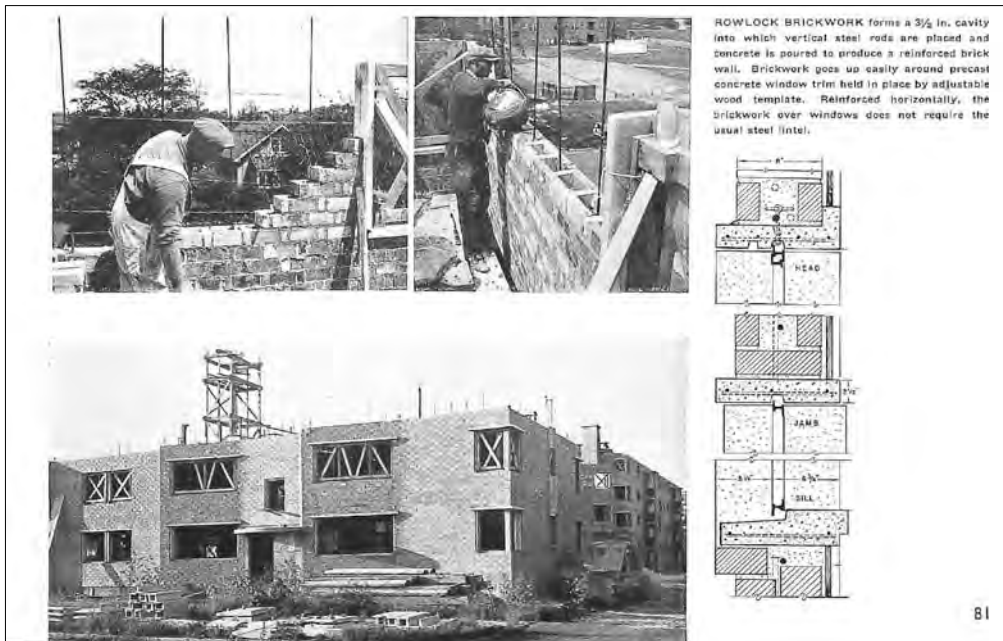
Winchester Hood Apartments under construction, showing reinforced brick wall construction used in Parkway Garden Homes.
